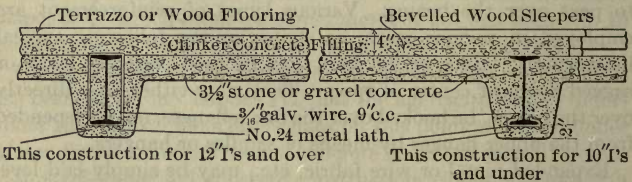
Paneled Floor Construction, U. S. Court House & P. O., Los Angeles, Cal.
